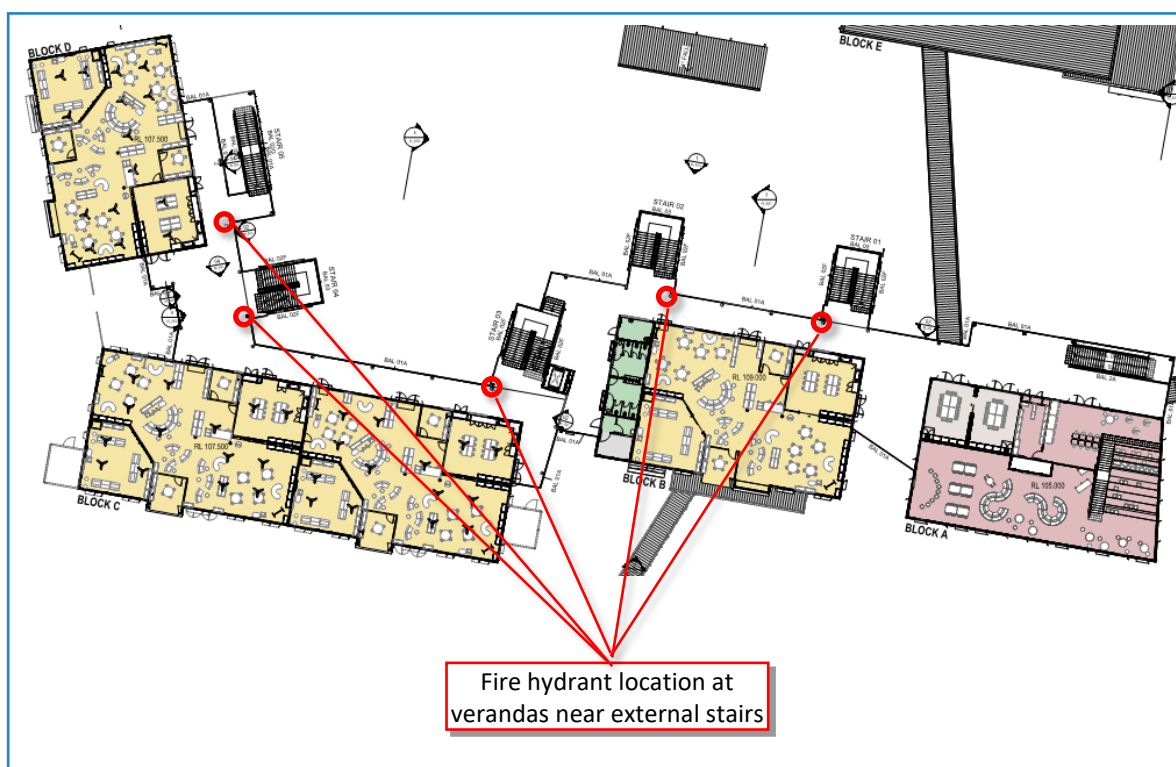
Fire hydrant location at verandas near external stairs on Level 02 Block A & B, Level 01 Block C & D
